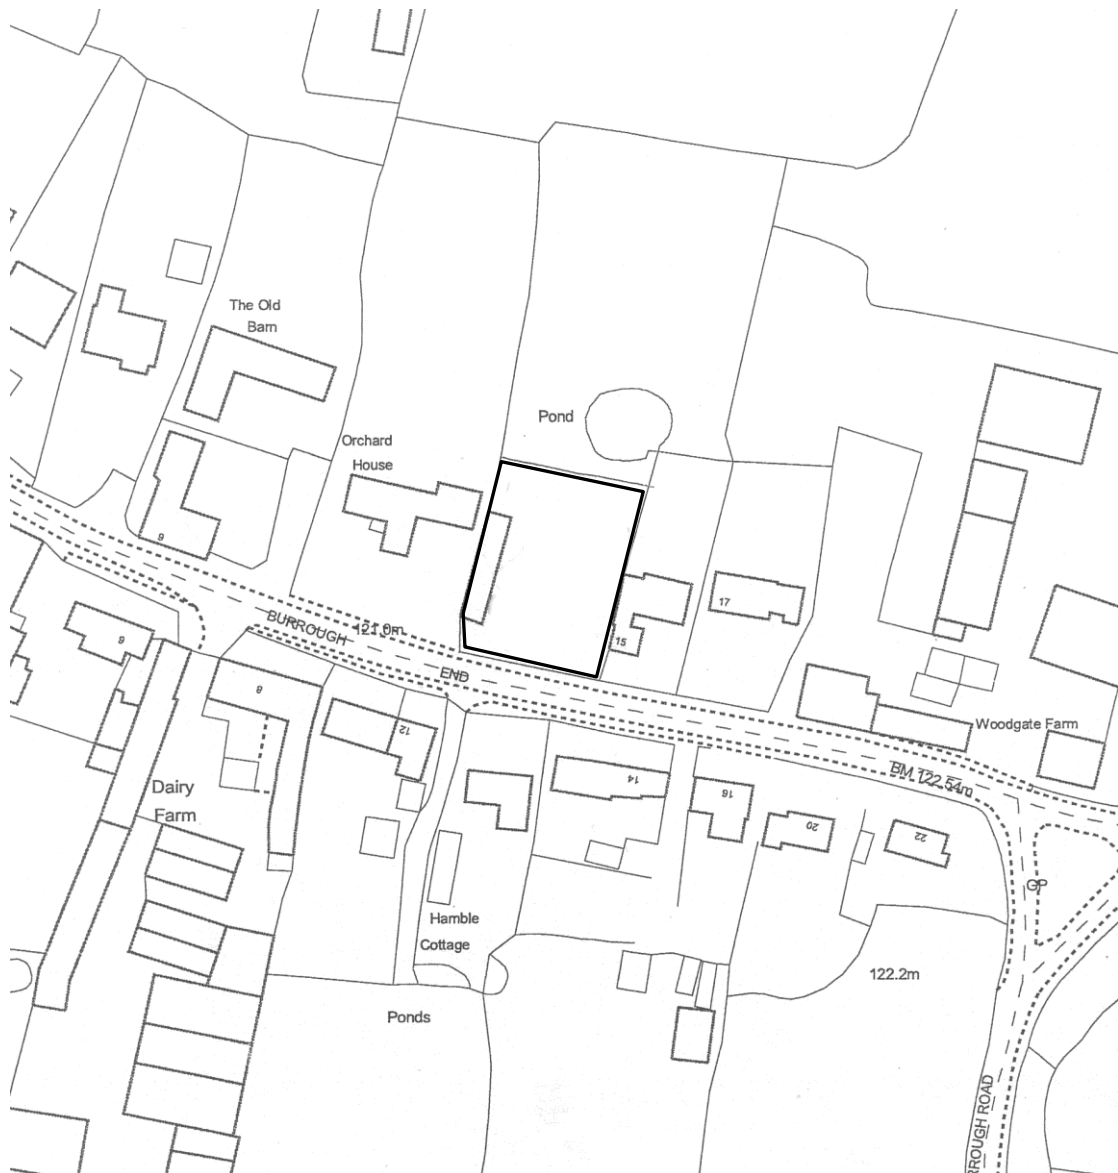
Plan of the site at 13, Burrough End. Scale 1: 1250
